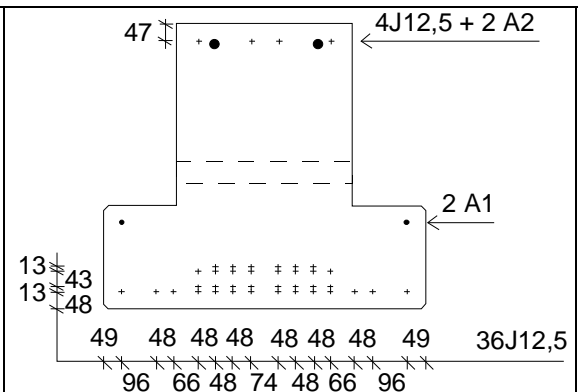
Longitudinal reinforcement. J12,5 refers to a prestressing strand; A1 and A2 to ribbed reinforcing bars, see below.
